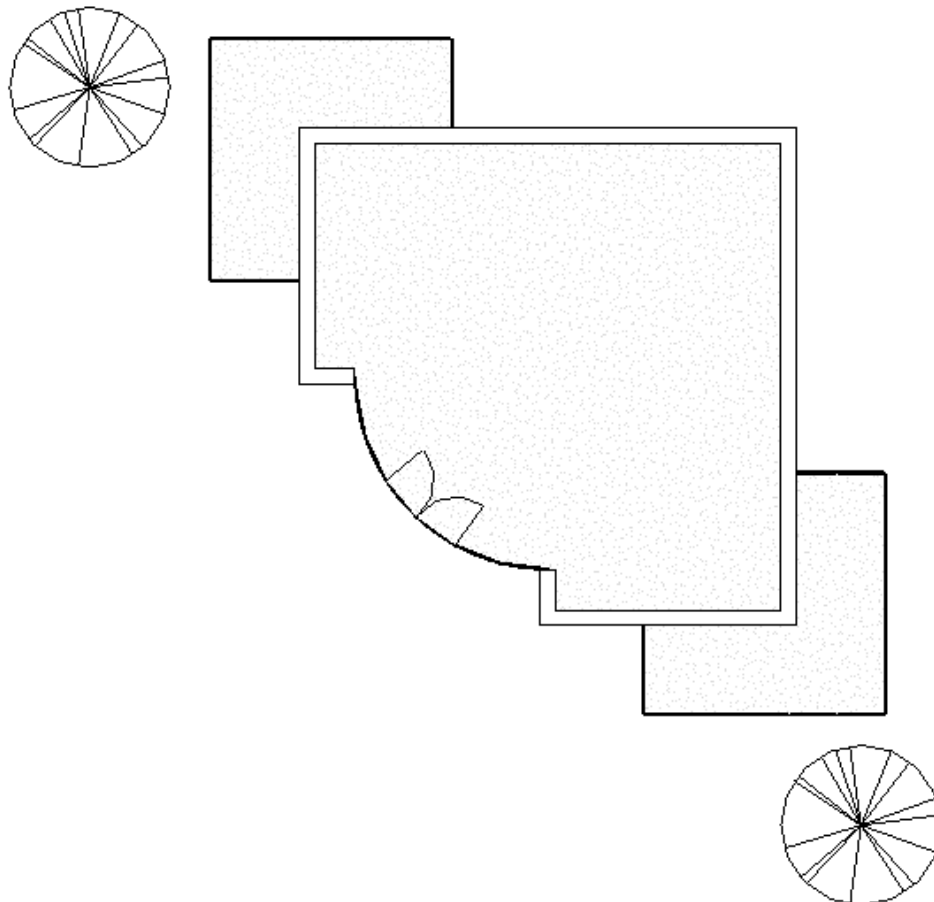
Sketch plan for adding trees to the Office building 2 project
